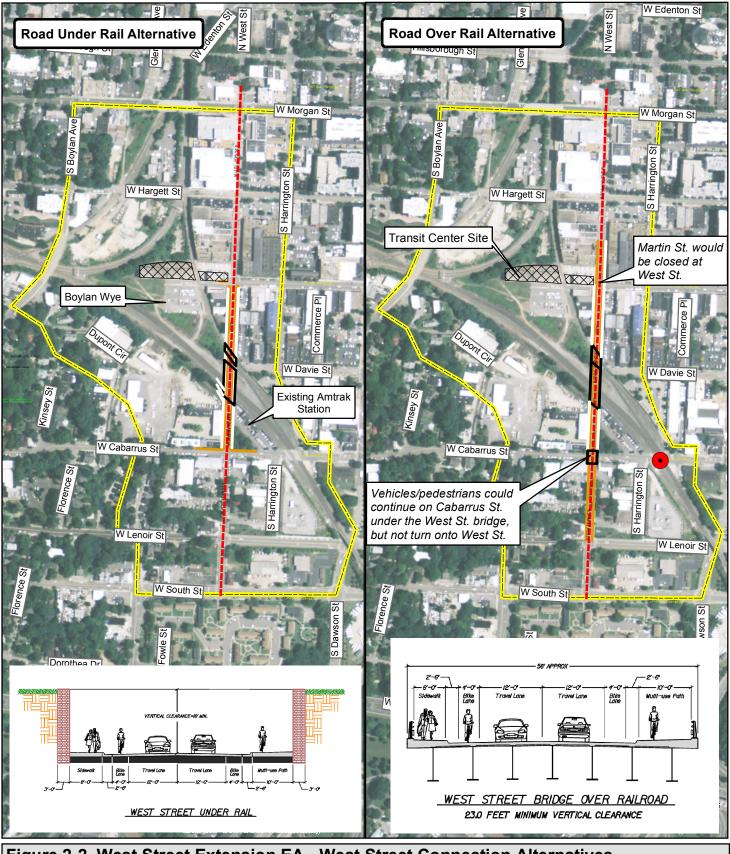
West Street Extension EA - West Street Connection Alternatives
